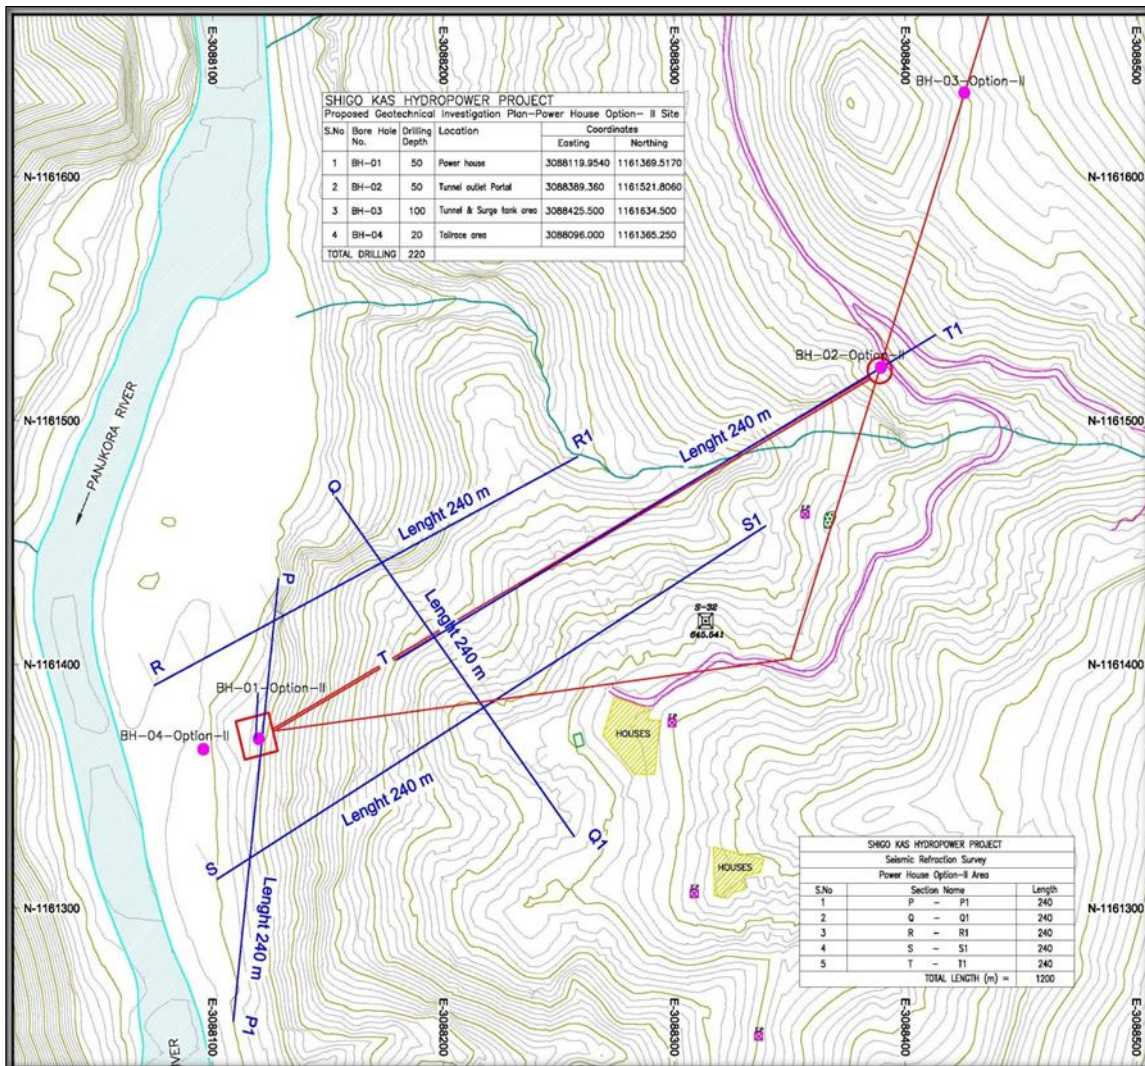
Seismic layout plan at power house of Shigo Kas HPP
